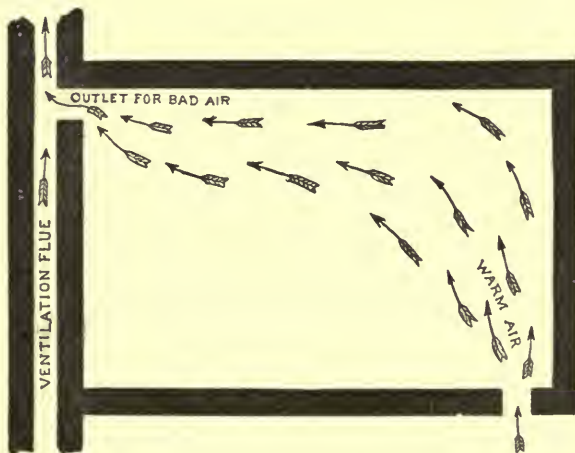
GRAVITY SYSTEM, WITH INLET NEAR THE FLOOR AND OUTLET NEAR THE CEILING ON THE OPPOSITE SIDE.
